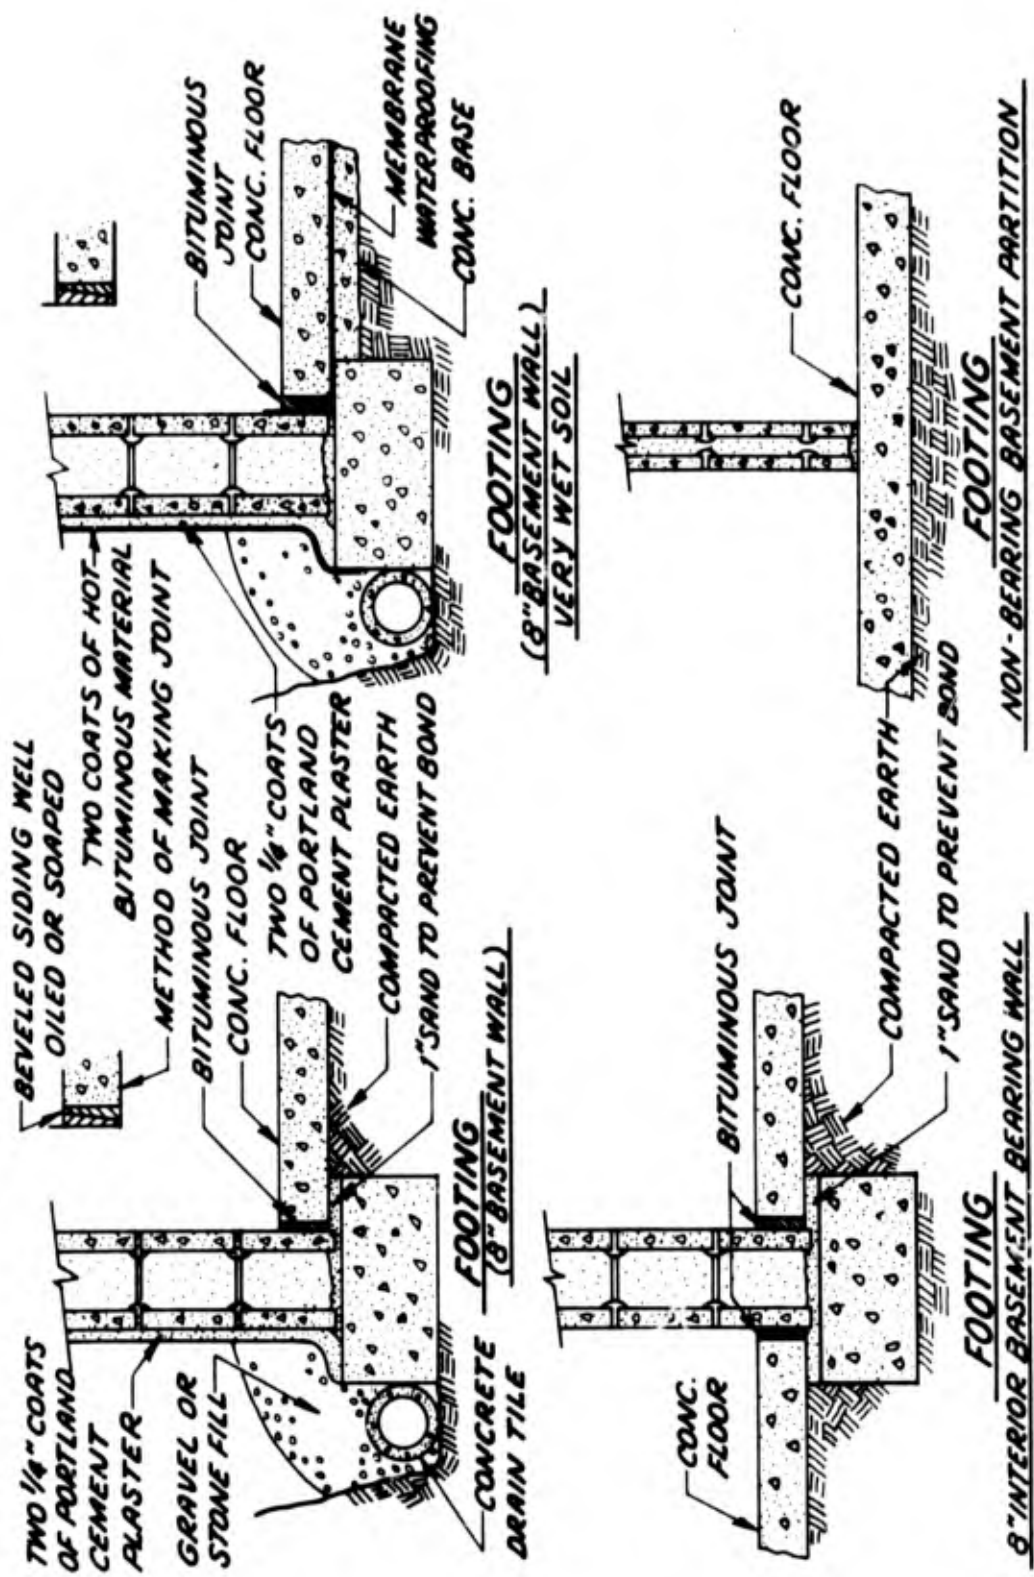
Footing designs for various foundation walls. If reinforcing is used in any of the above slabs the slab is designated a Type II slab.
